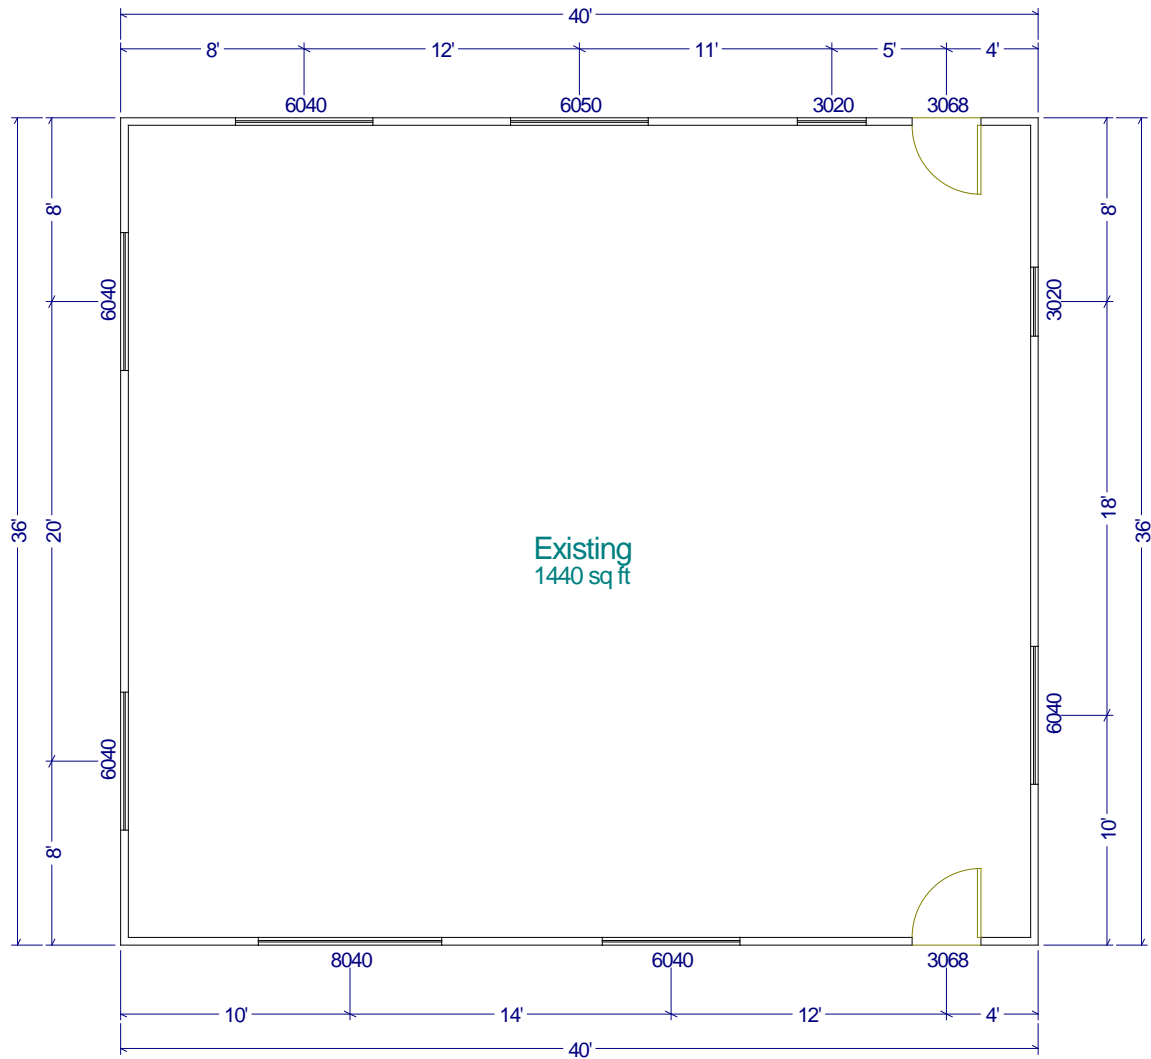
Addition/Alteration Prototype Floor Plan without Addition
